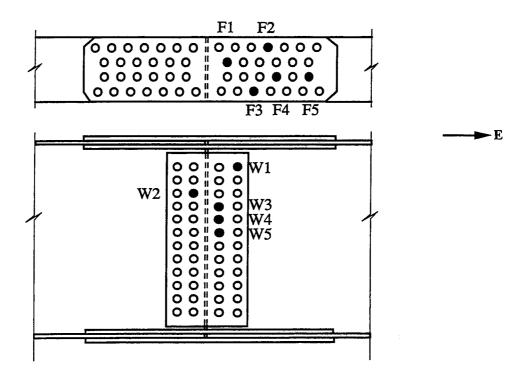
(c) Location of sampled bolts in connection E3 of bridge B3
